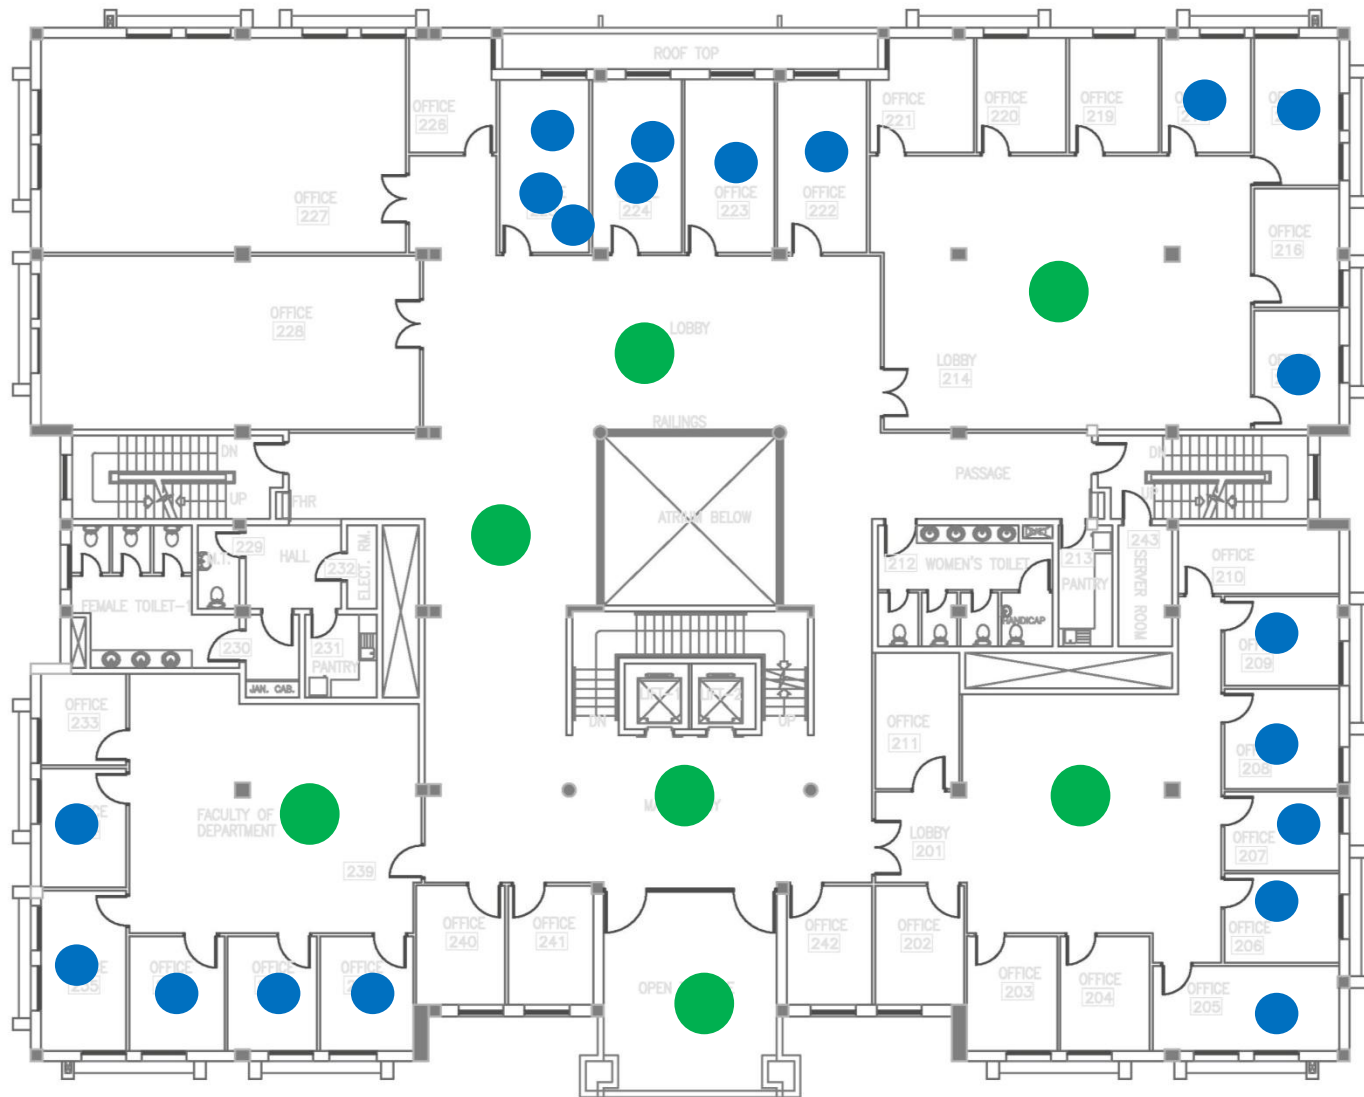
Women's foundation – Second floor- 2:00-2:15 pm
